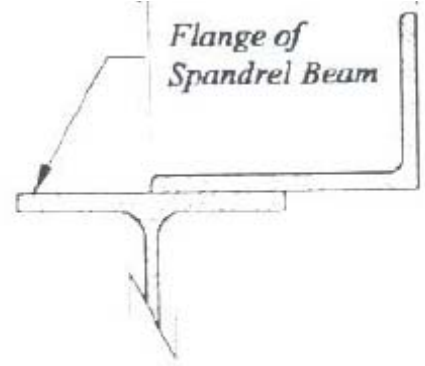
Metal Stud Crete Connection to Angle/ Pair Stop
